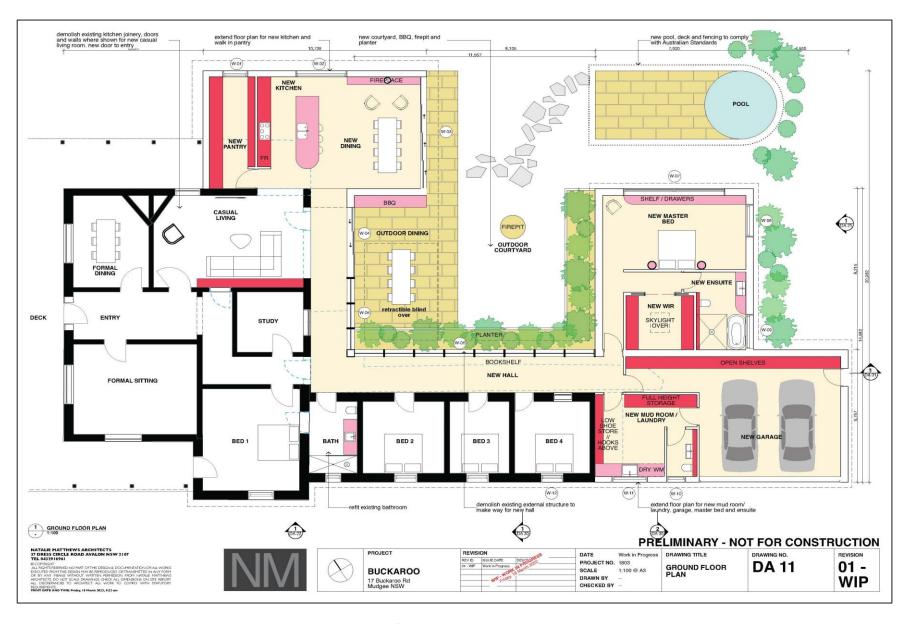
Ground Floor Layout Plan of the Existing Dwelling with Alterations / Additions
